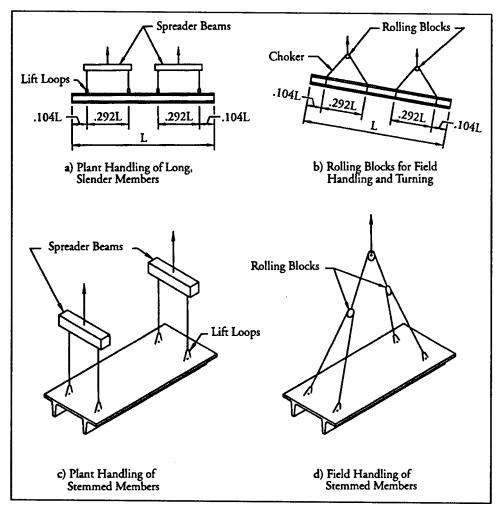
Typical lifting devices and arrangements for precast concrete members
